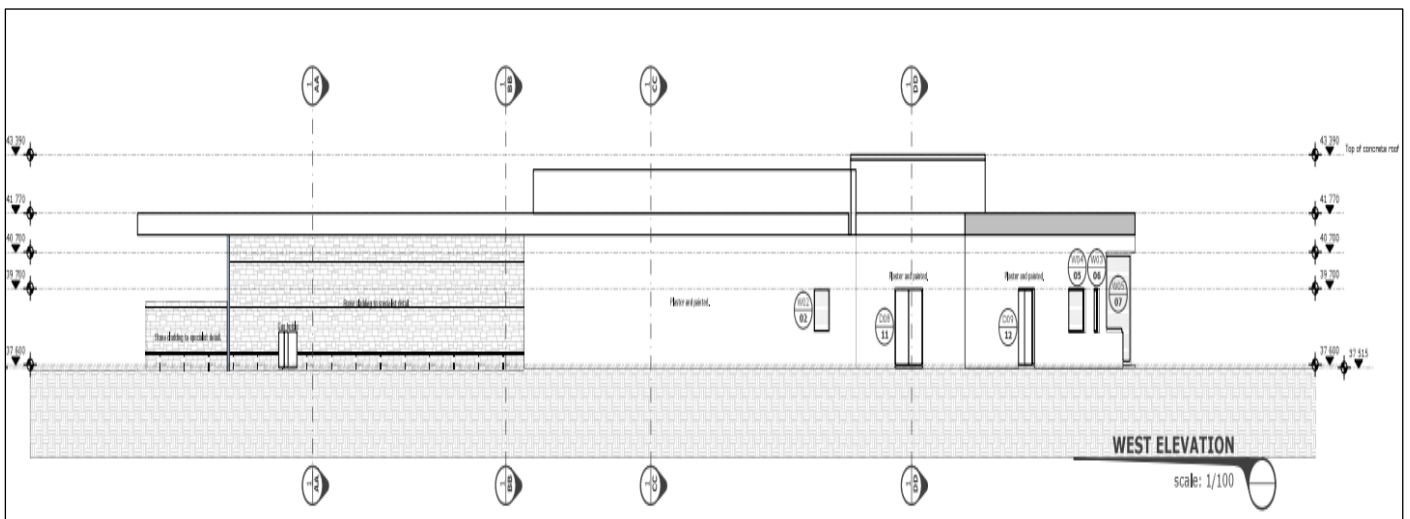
West elevation of the proposed entertainment facility (TMBA, 2018)
